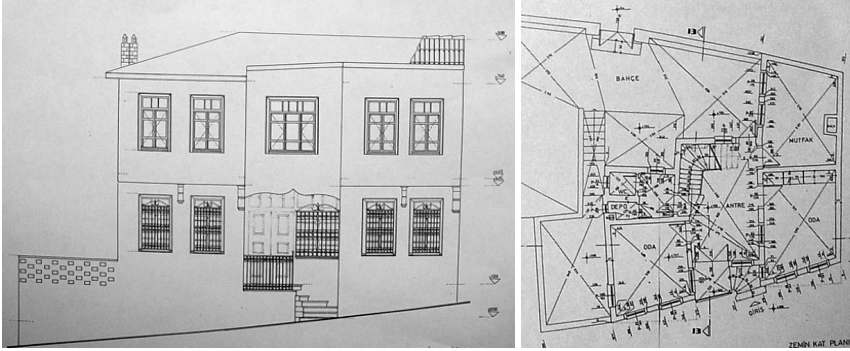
Sumer Street House Front Elevation and First Floor Plan
